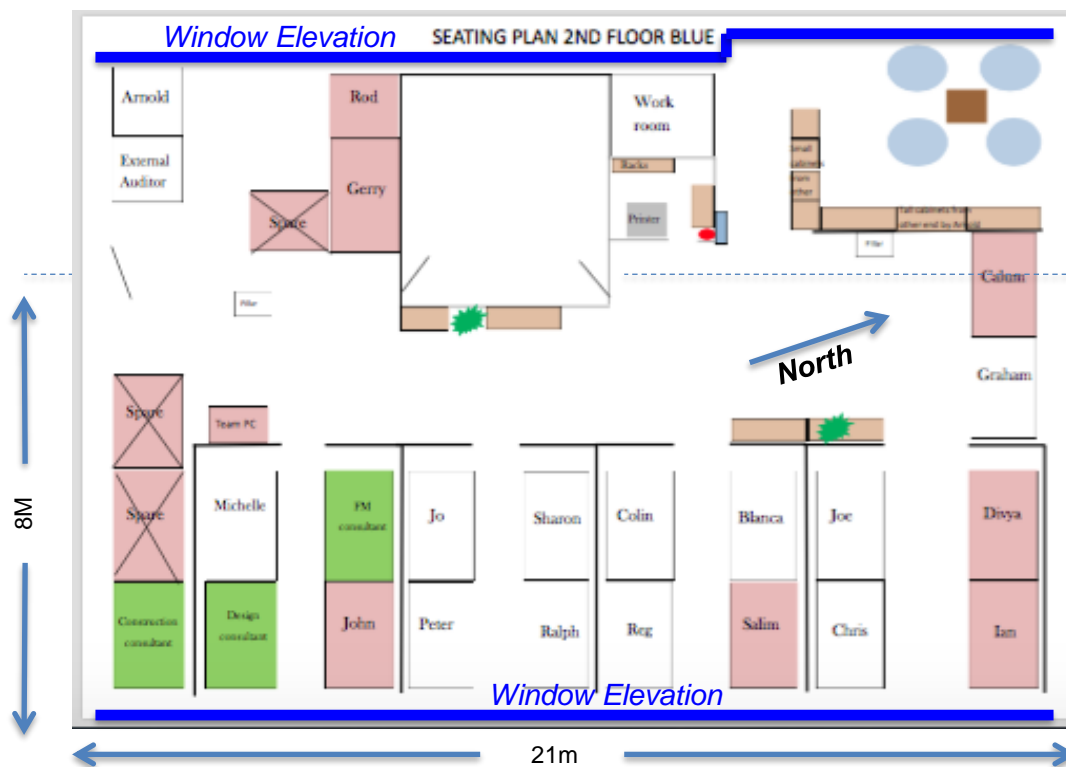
BSRIA Office Layout – Level 2 Blue Building – Bracknell (UK)
